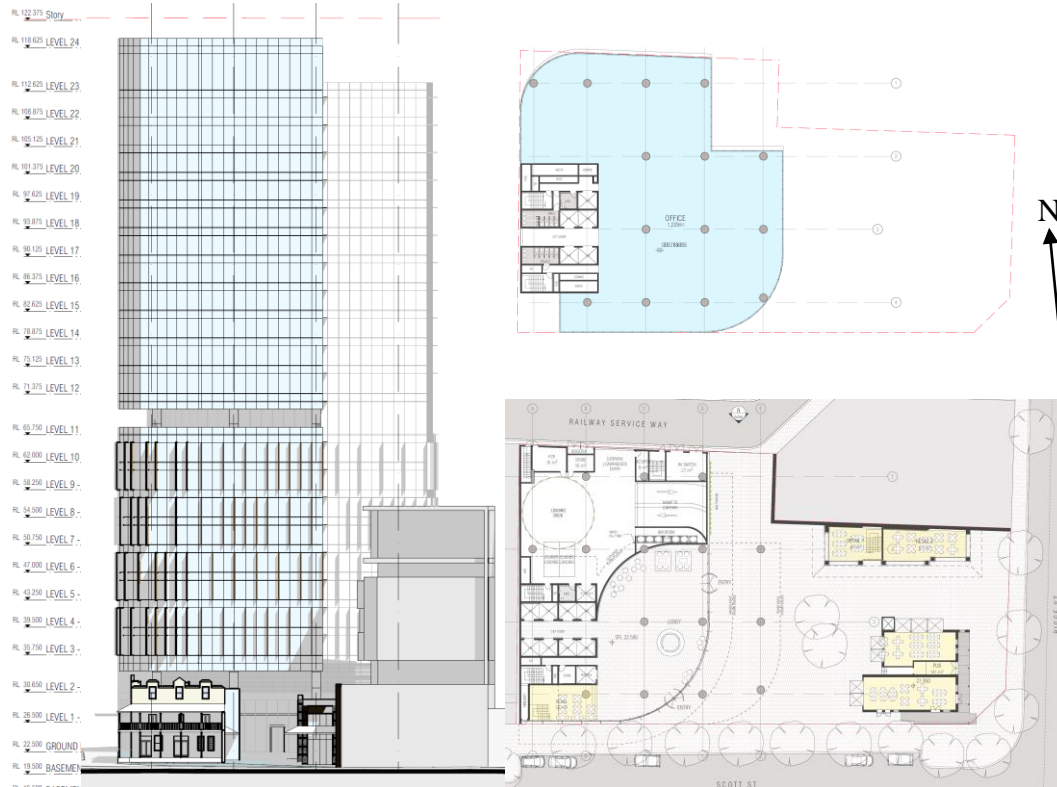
East elevation (L), and ground and typical high-rise floor plan (R)
